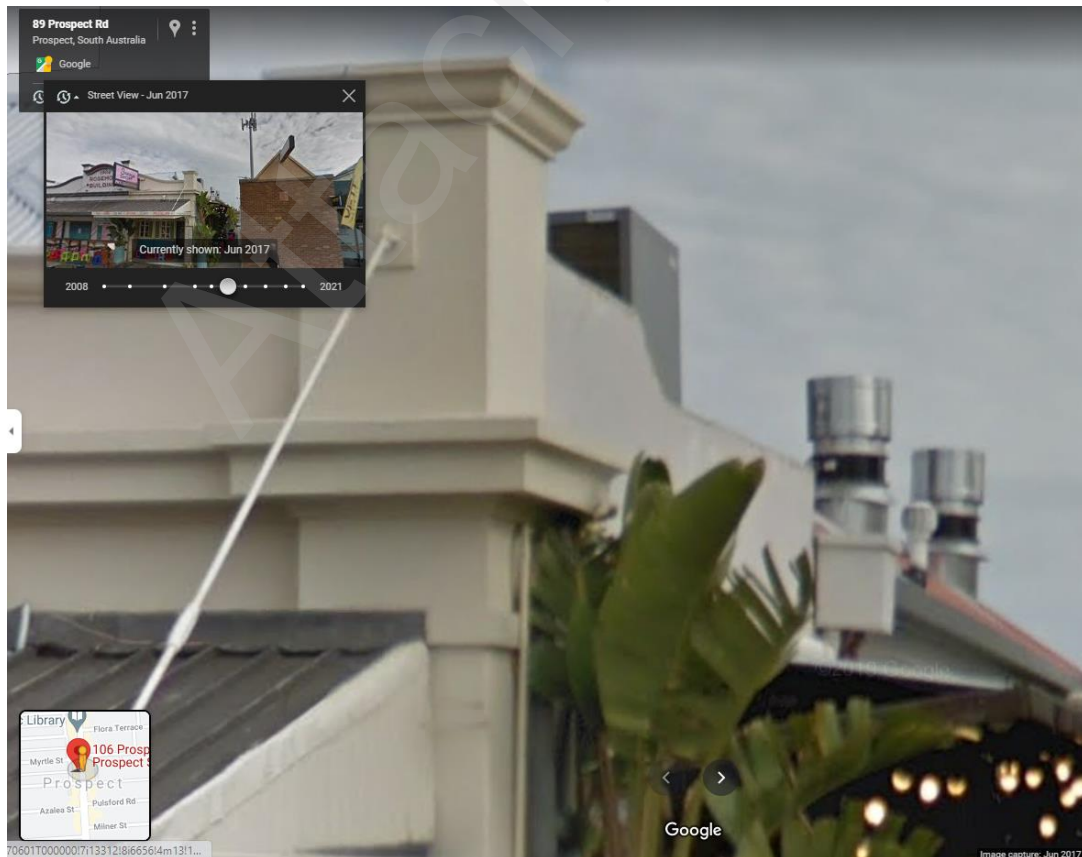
Google Street View image dated June 2017 (latest available image with unobstructed view of cracked wall)
